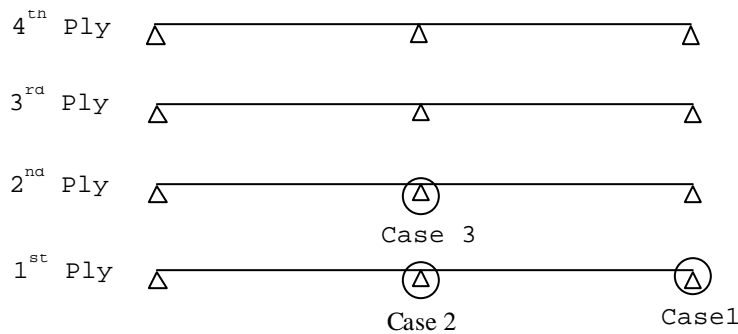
Locations of Unsupported Plies – 2-Span Bridge Chord
